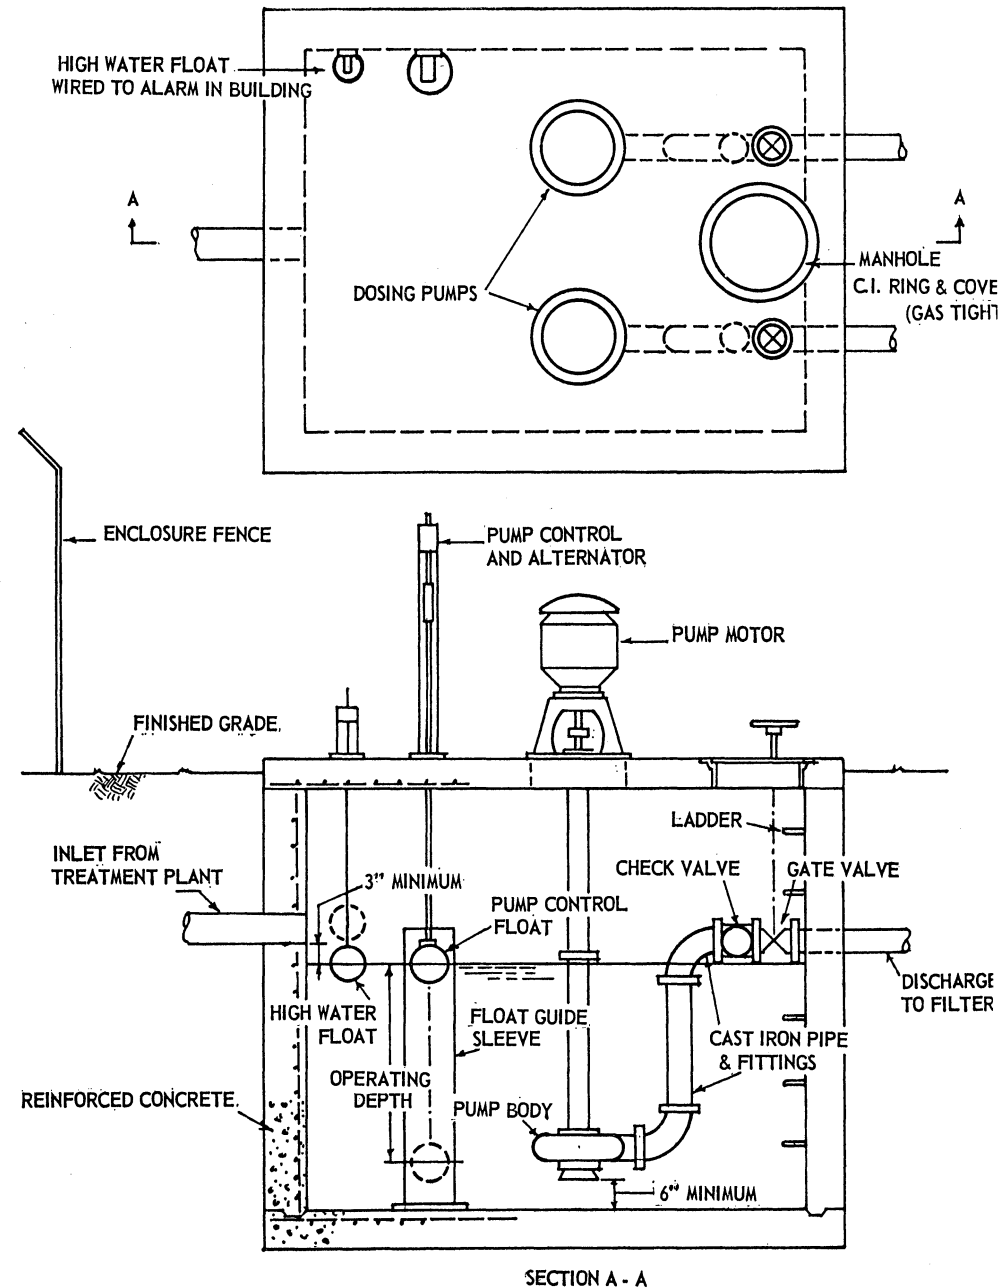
DOSING TANK AND ALTERNATING PUMPS
